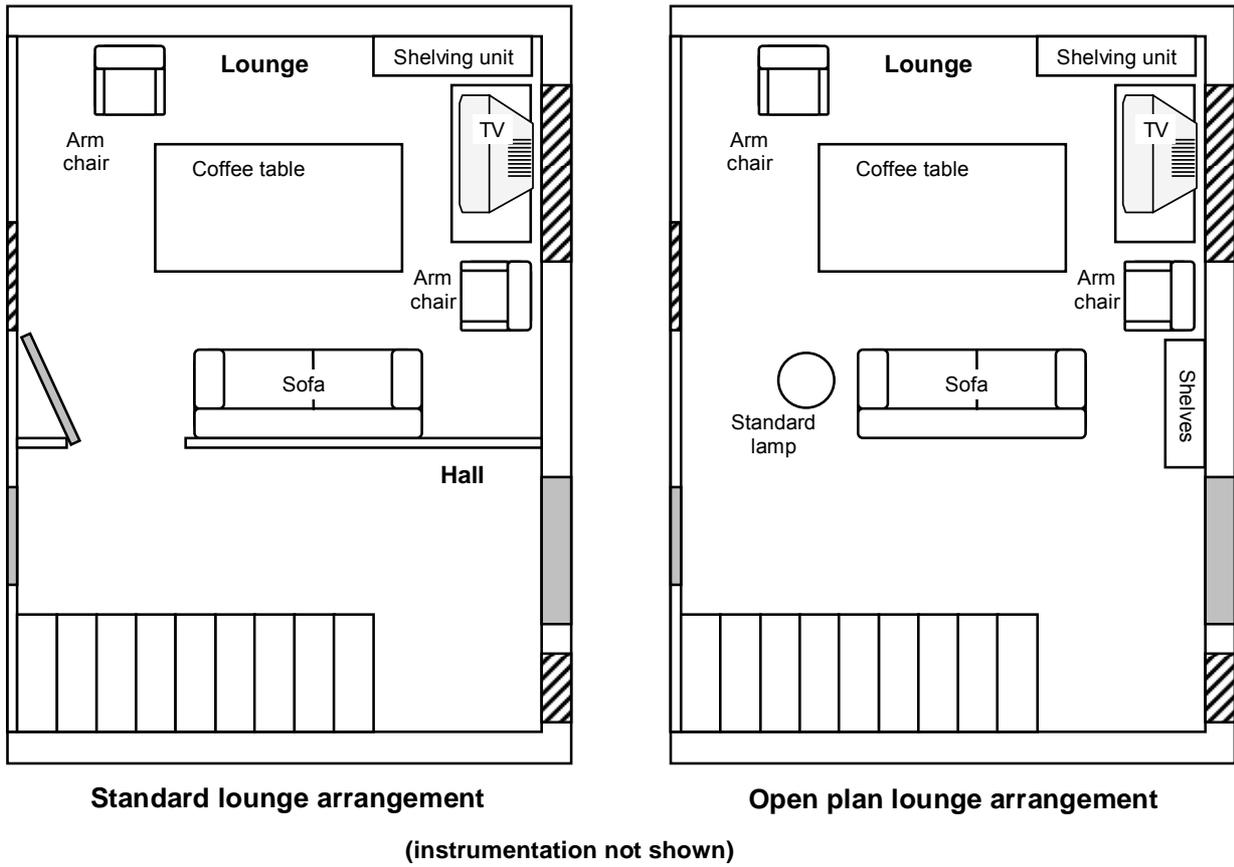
Schematic diagram showing the standard and open plan lounge furniture arrangements
